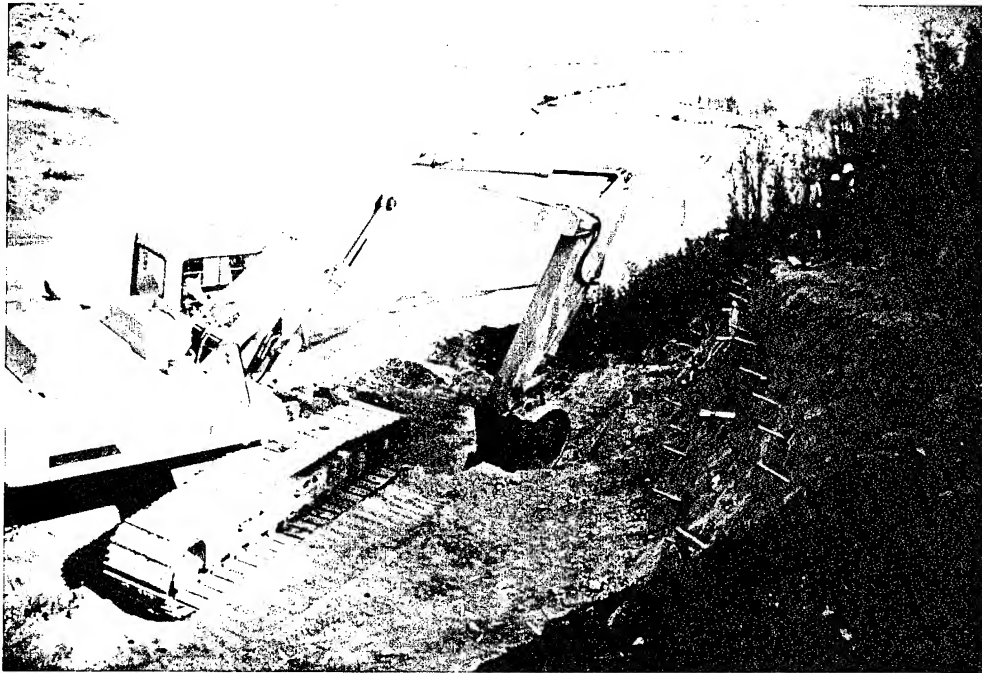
Hitachi trackhoe excavating a bench at the downstream portal.
